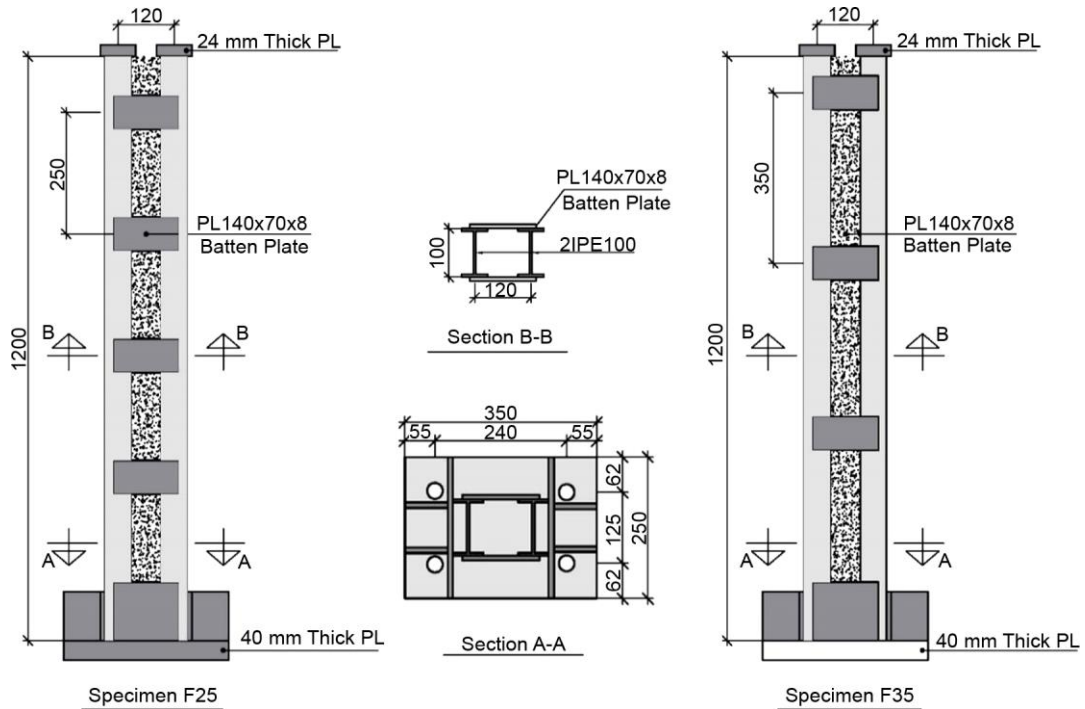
Detailing and dimensions of specimens (dimensions in mm).
